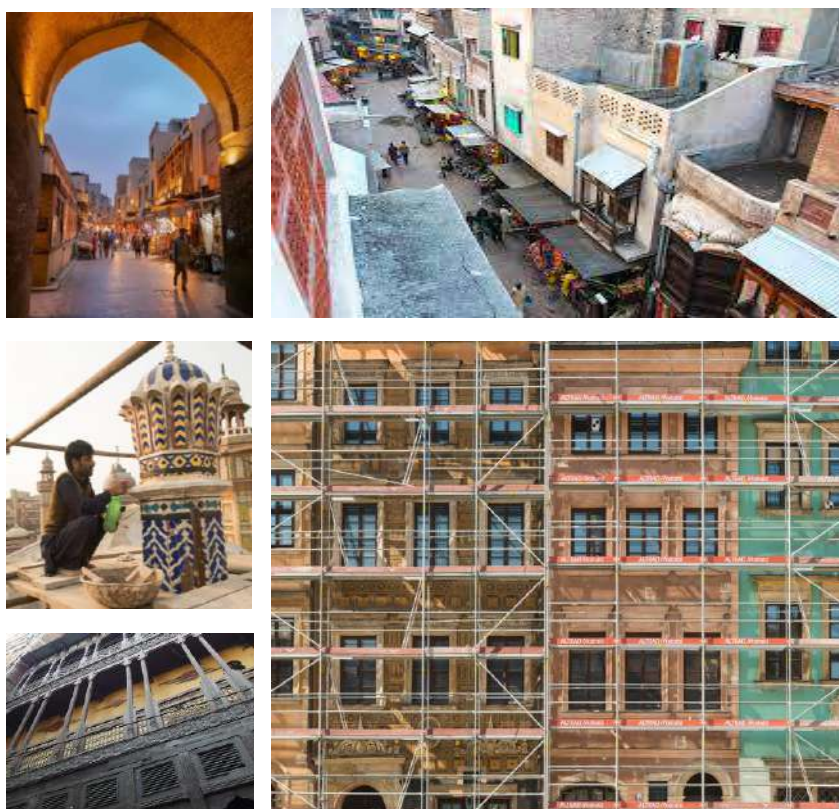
Façade Uplift, Historic Buildings Preservation & Sidewalks Uplifting
